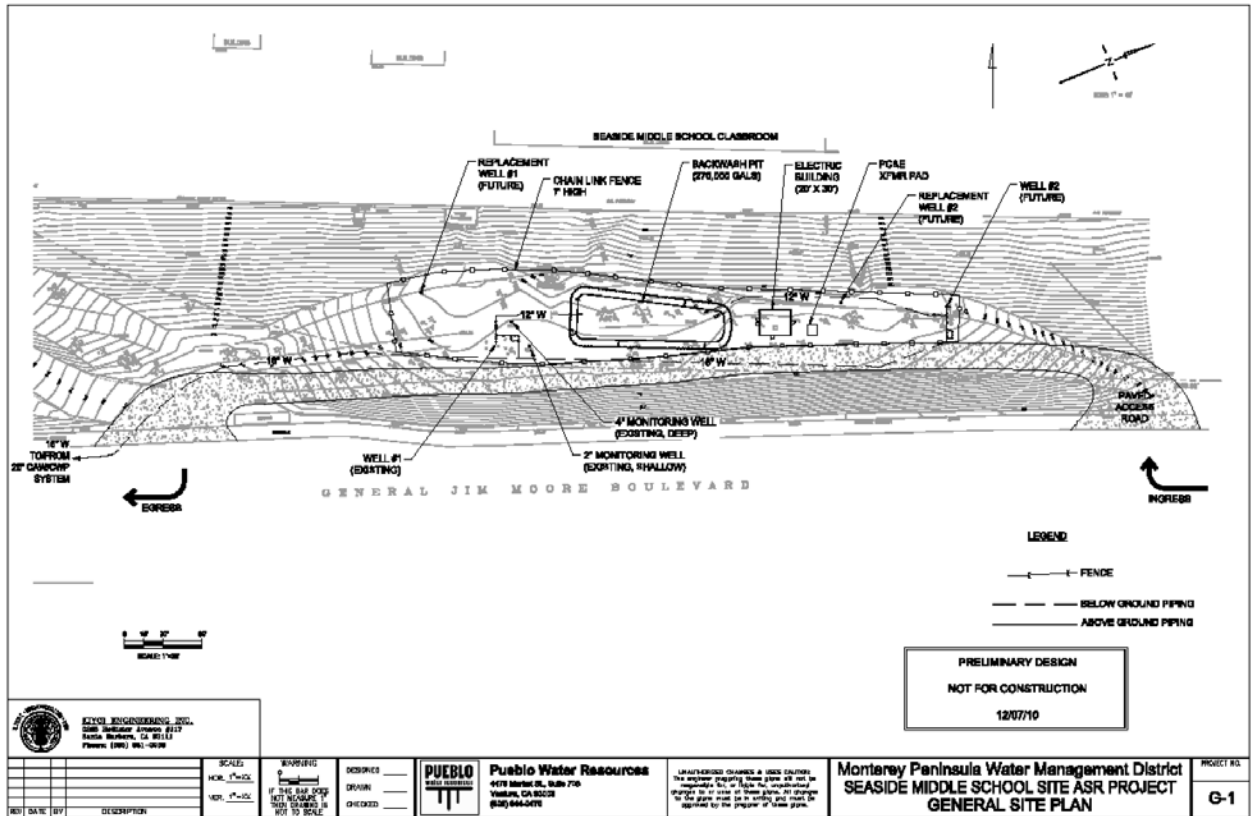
Preliminary site development plan for Water Project 2 (Seaside Middle School) ASR facilities.
